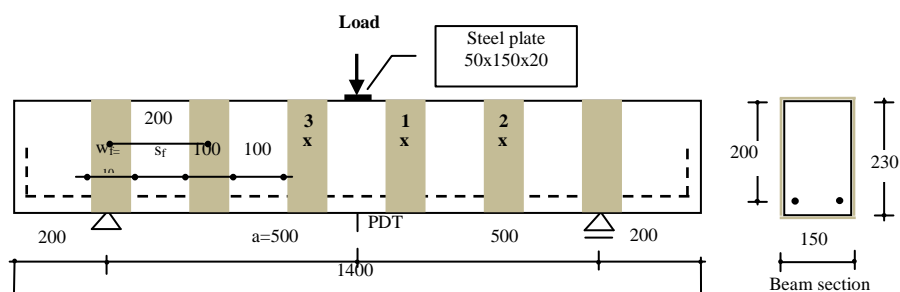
Locations of PDT, strain gauges(1, 2, 3) and section of the test beams (unit: mm)
